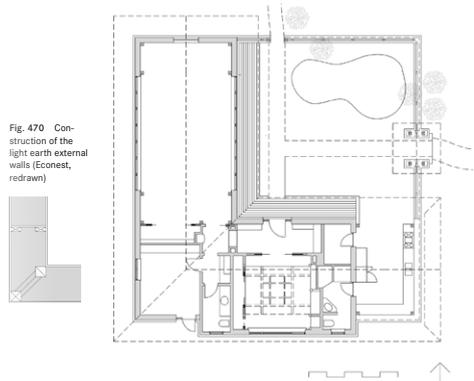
Construction of the light earth external walls (Econest, redrawn)
